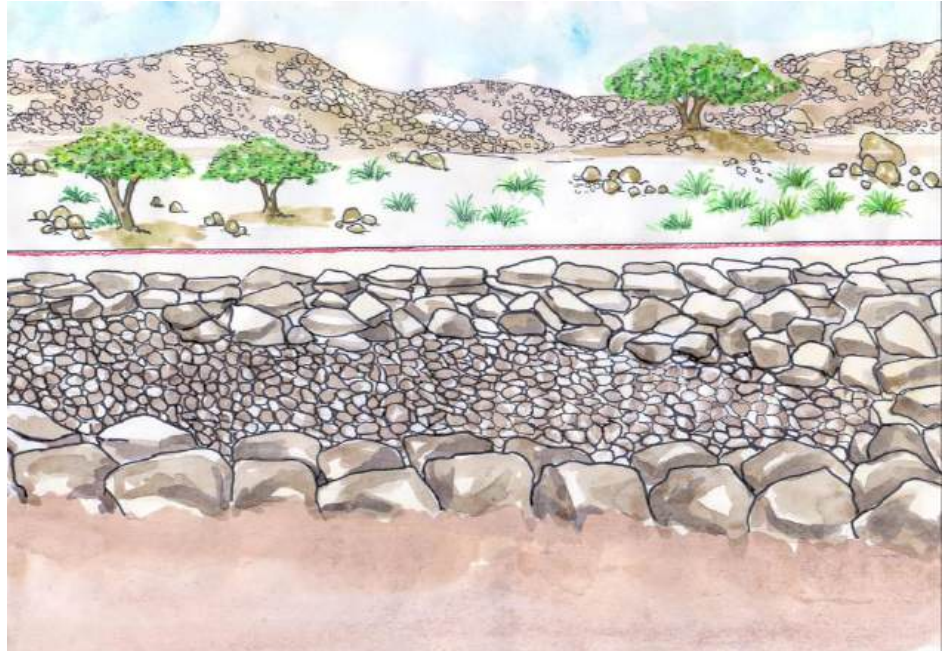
The construction seen from upstream. The wall made of big stones, the rope demarcating the upper straight line of the dam. Small stones in the back indicate that the construction is not yet finished. A cover layer of big stones is missing.
